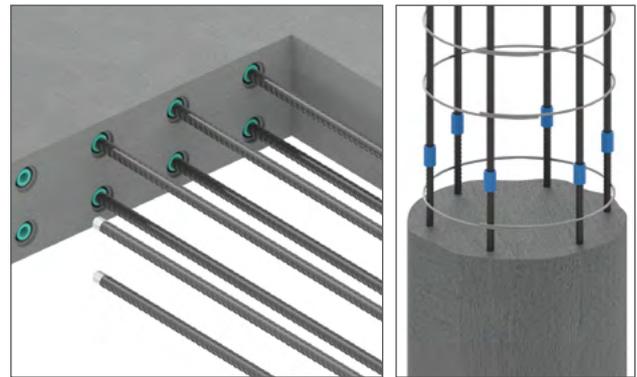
The use of couplers at concrete faces means that concrete elements can be joined without the need to drill through formwork (left). Couplers can be used to join prefabricated cages on site, making on-site welding unnecessary (right).
